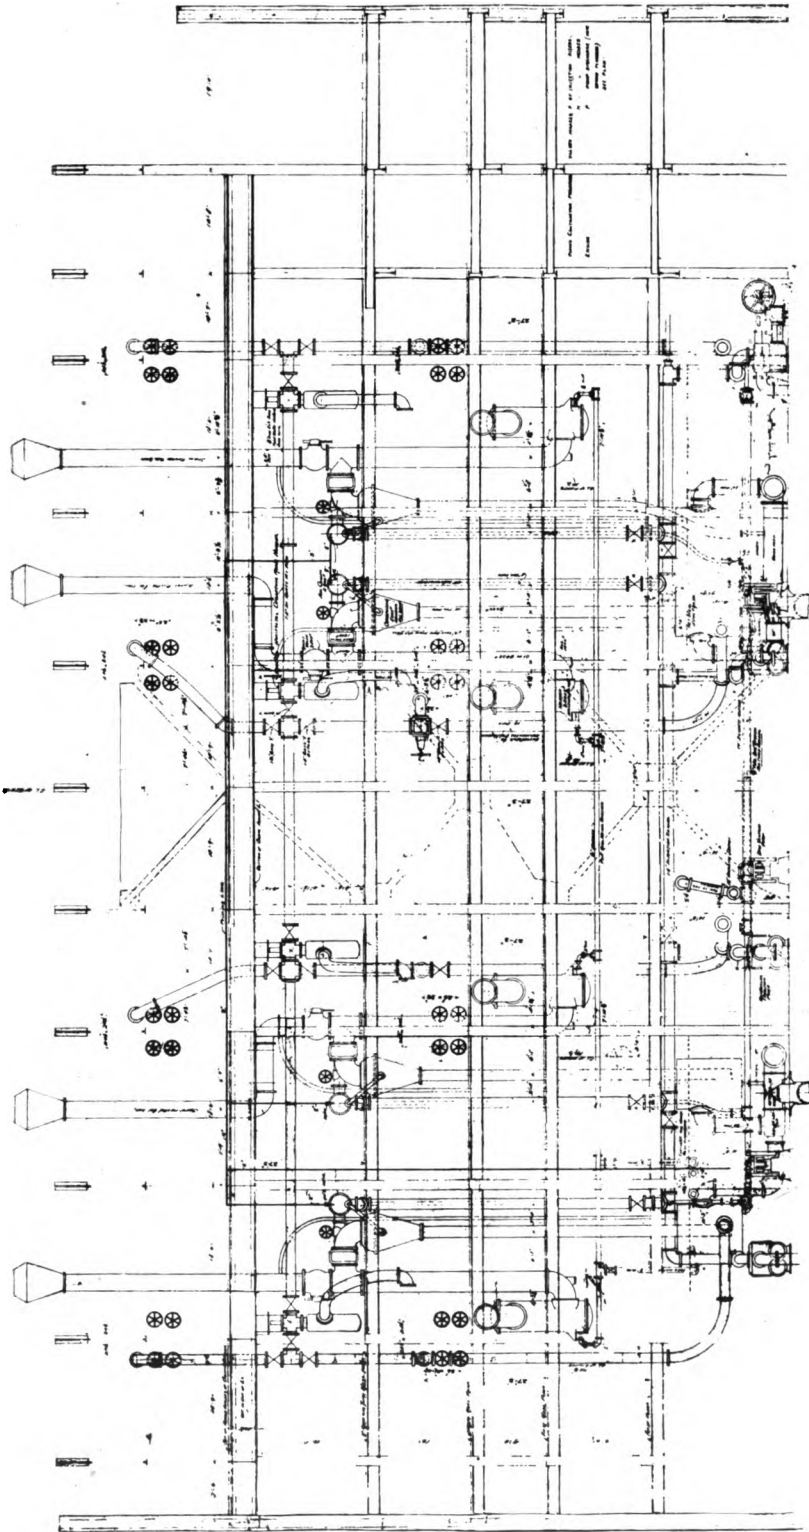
Elevation of Condensers and Their Connections on Boiler Room Side, Central Power Station, B. R. T.
